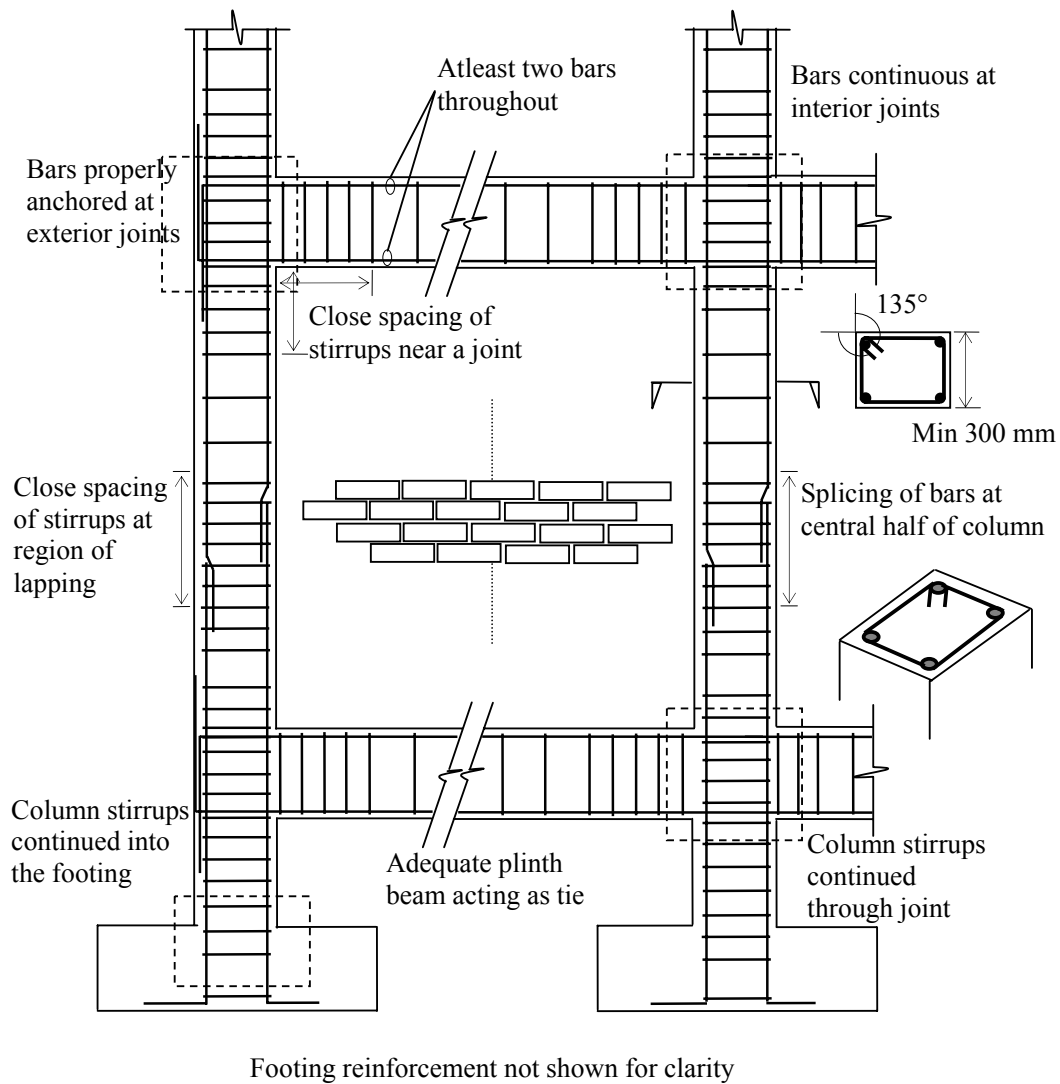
Elevation of a frame showing detailing for seismic forces
